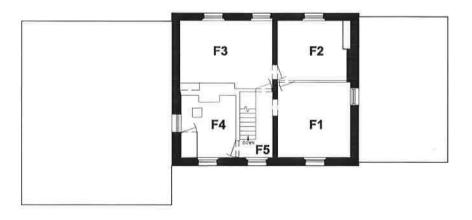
Floor plans, Secretary's Office Queen's House, Oakwood Hospital, Maidstone, Kent Oxford Archaeological Unit
